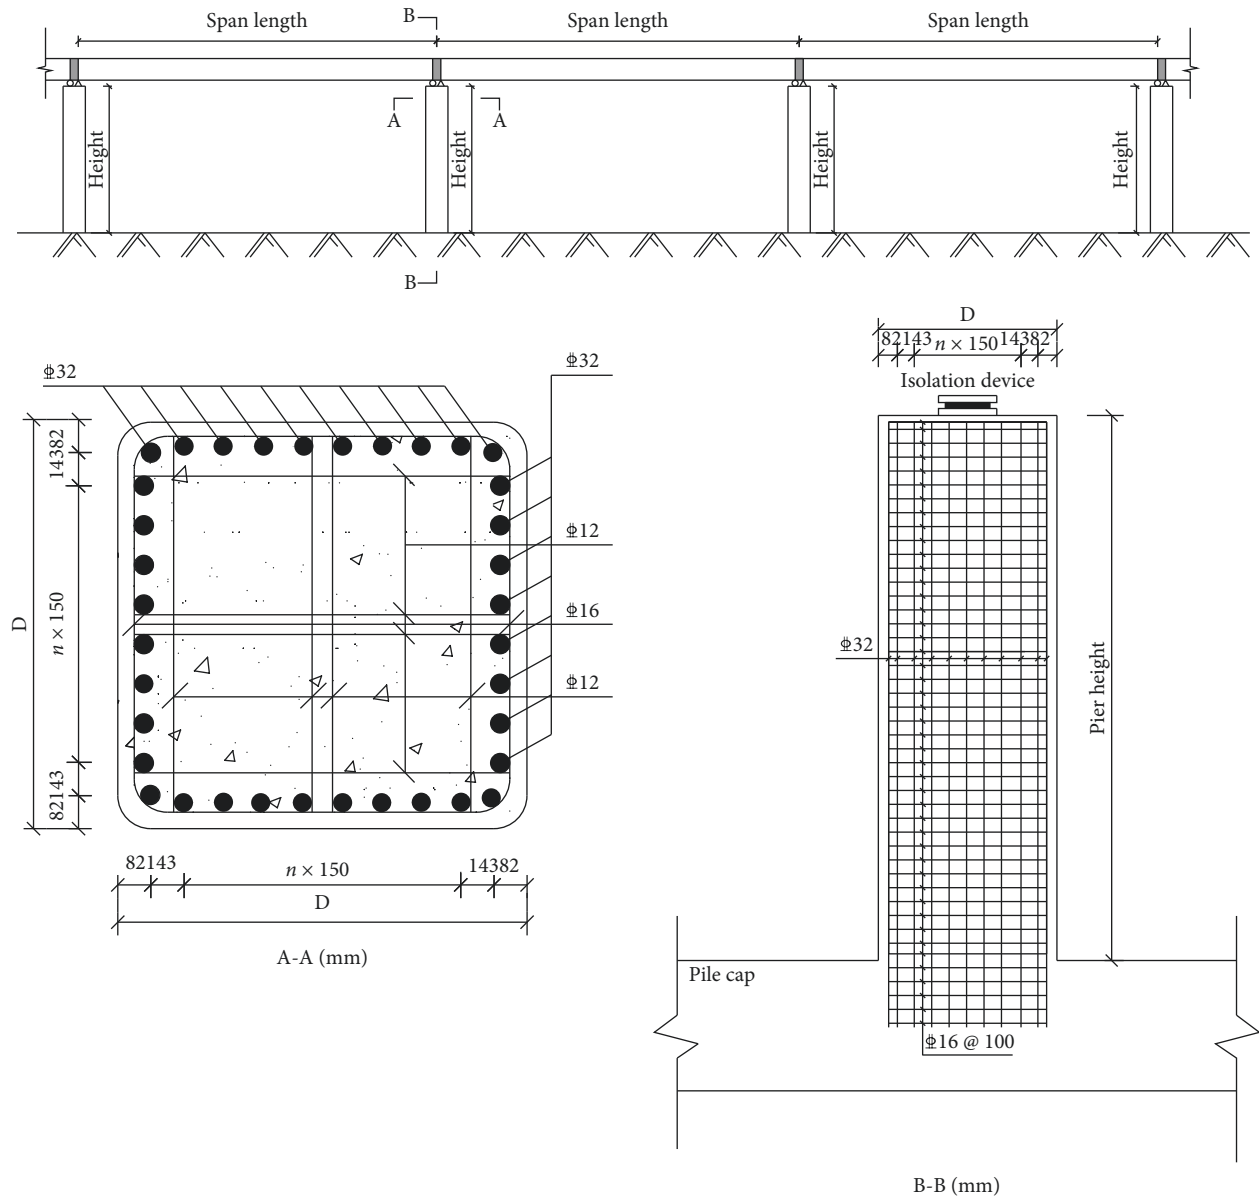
Elevation and pier section properties of simply supported girder bridge.
